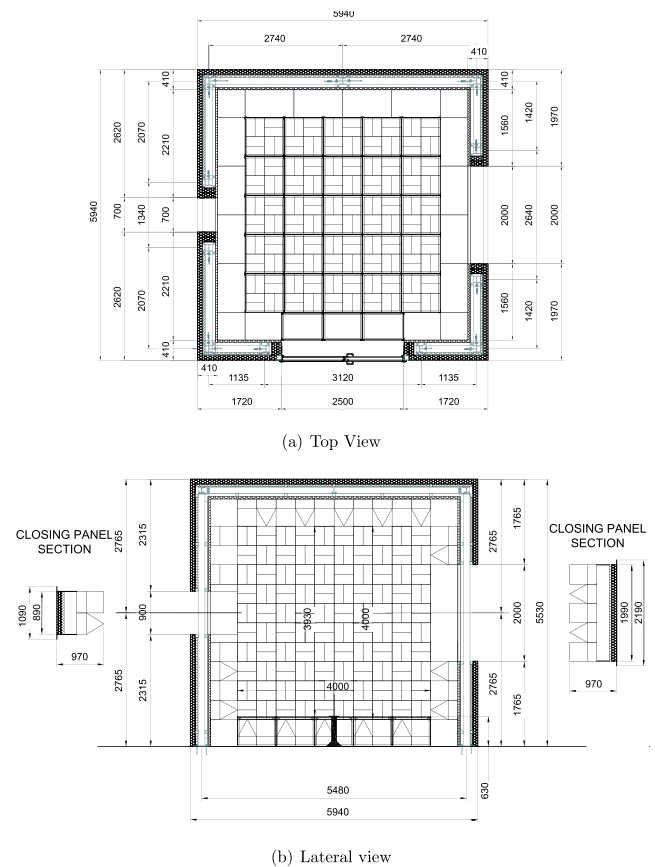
Anechoic chamber technical drawings (dimensions in mm).
